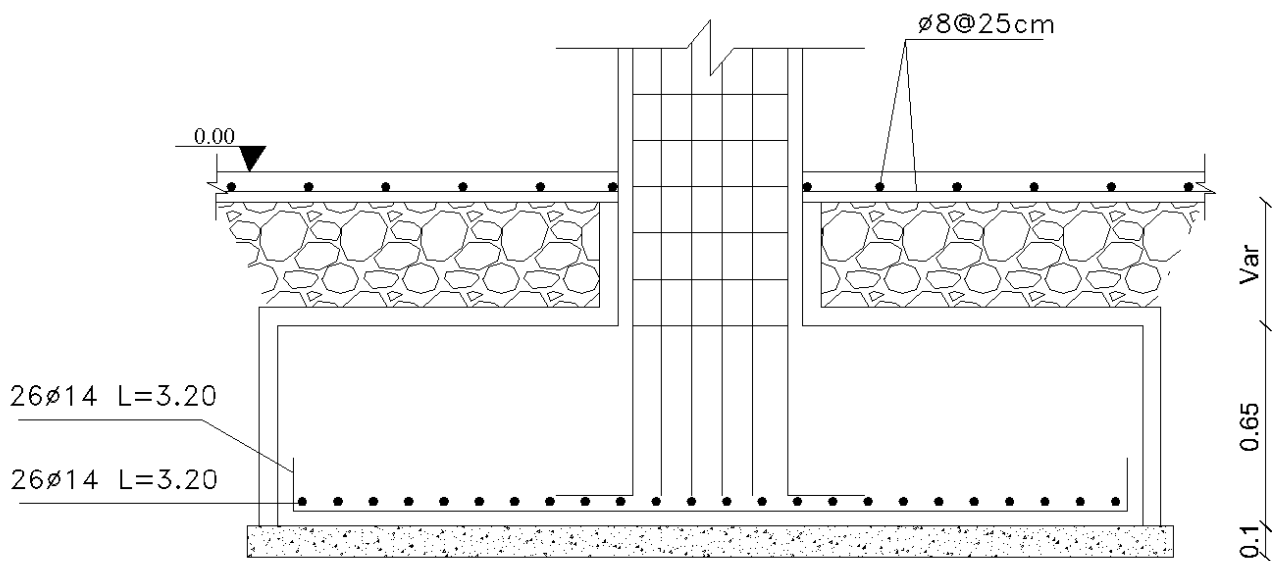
Reinforcement Detail Of Footing ( F8 )
